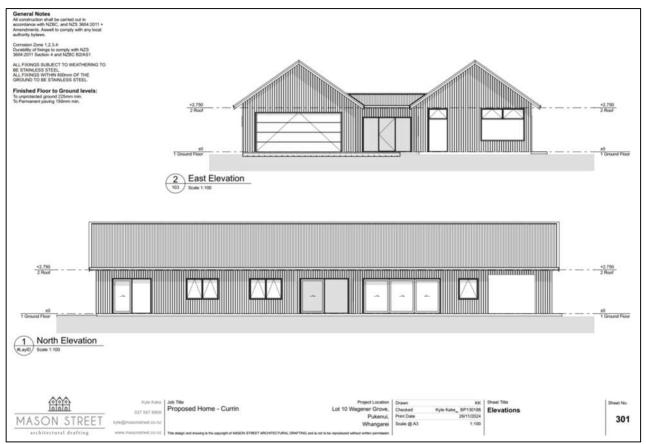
Screenshot of the East-North Elevation Plan from the supplied architectural drawings.
